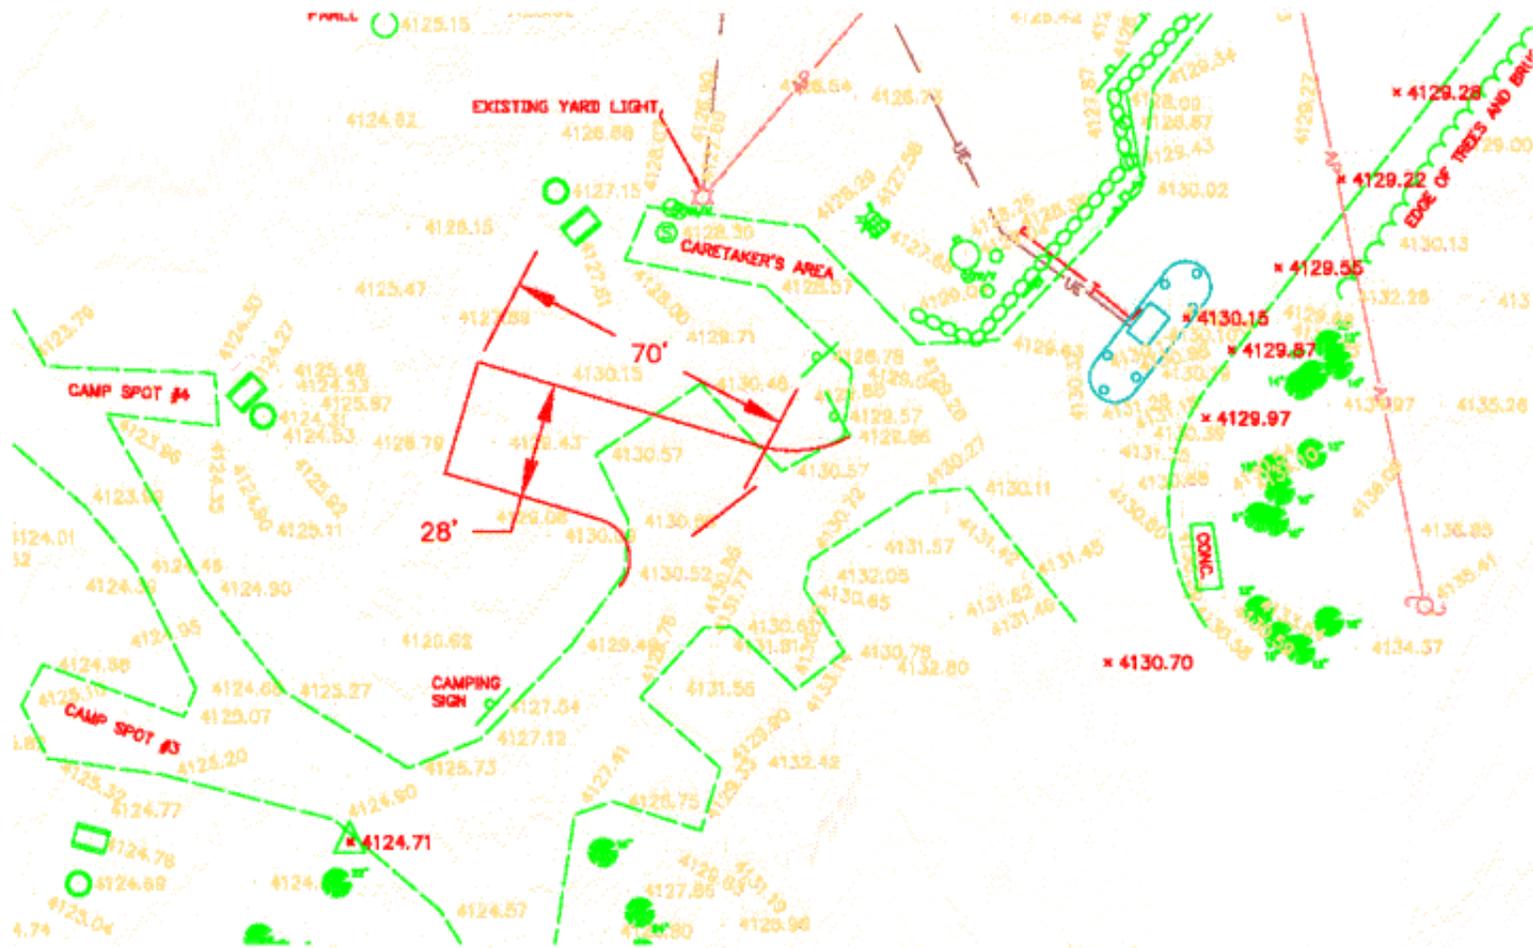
Details of proposed site plan for camp pad for volunteer host.
